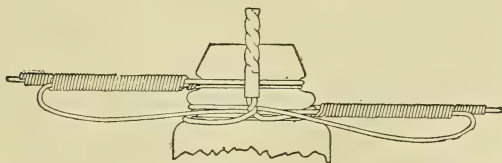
Double Terminating of 100-lb. Copper Wire
